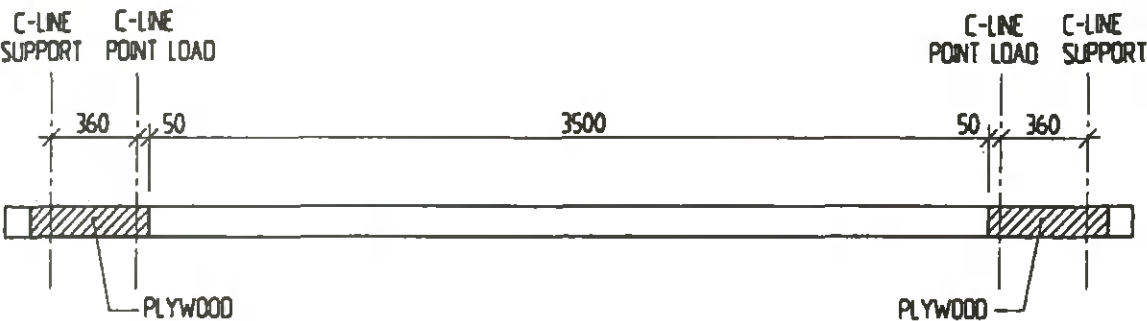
Test specimen reinforced with plywood. All sizes in mm.
